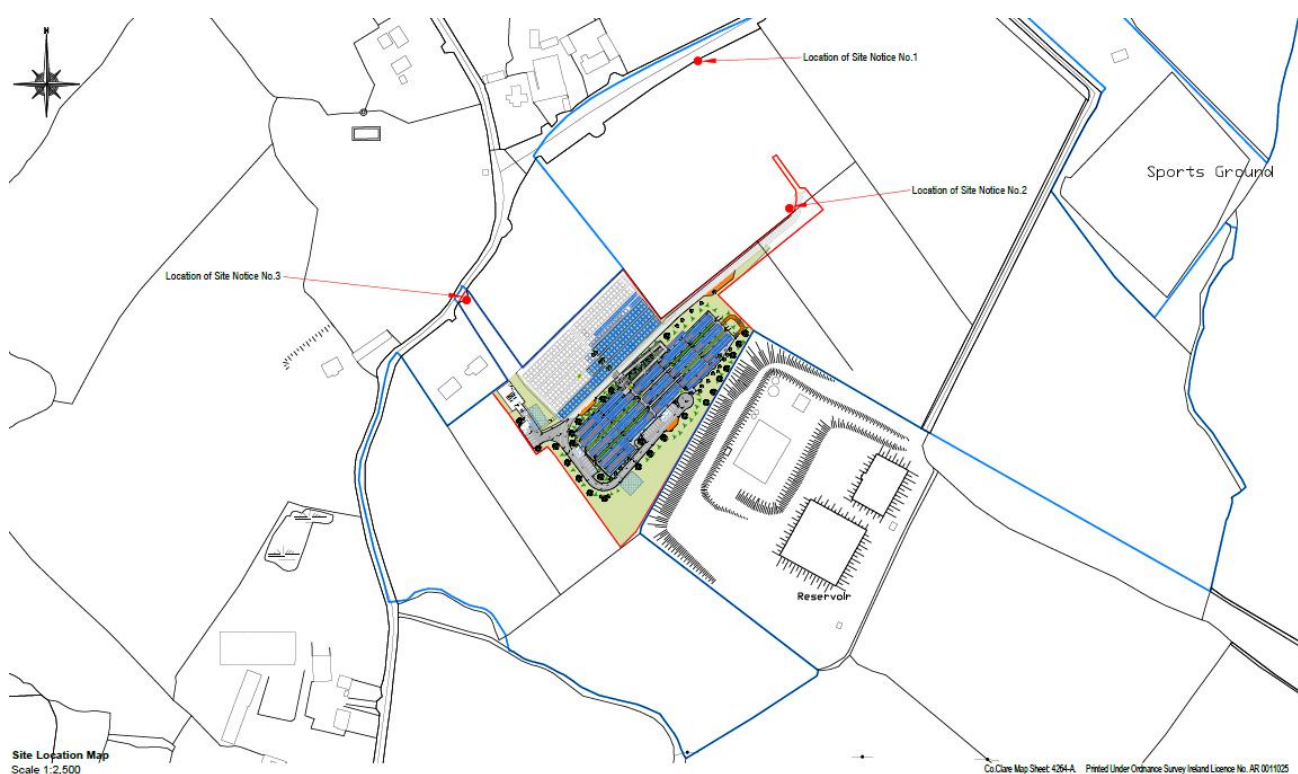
Site Location Plan of subject site (Source: P.Coleman & Associates)
